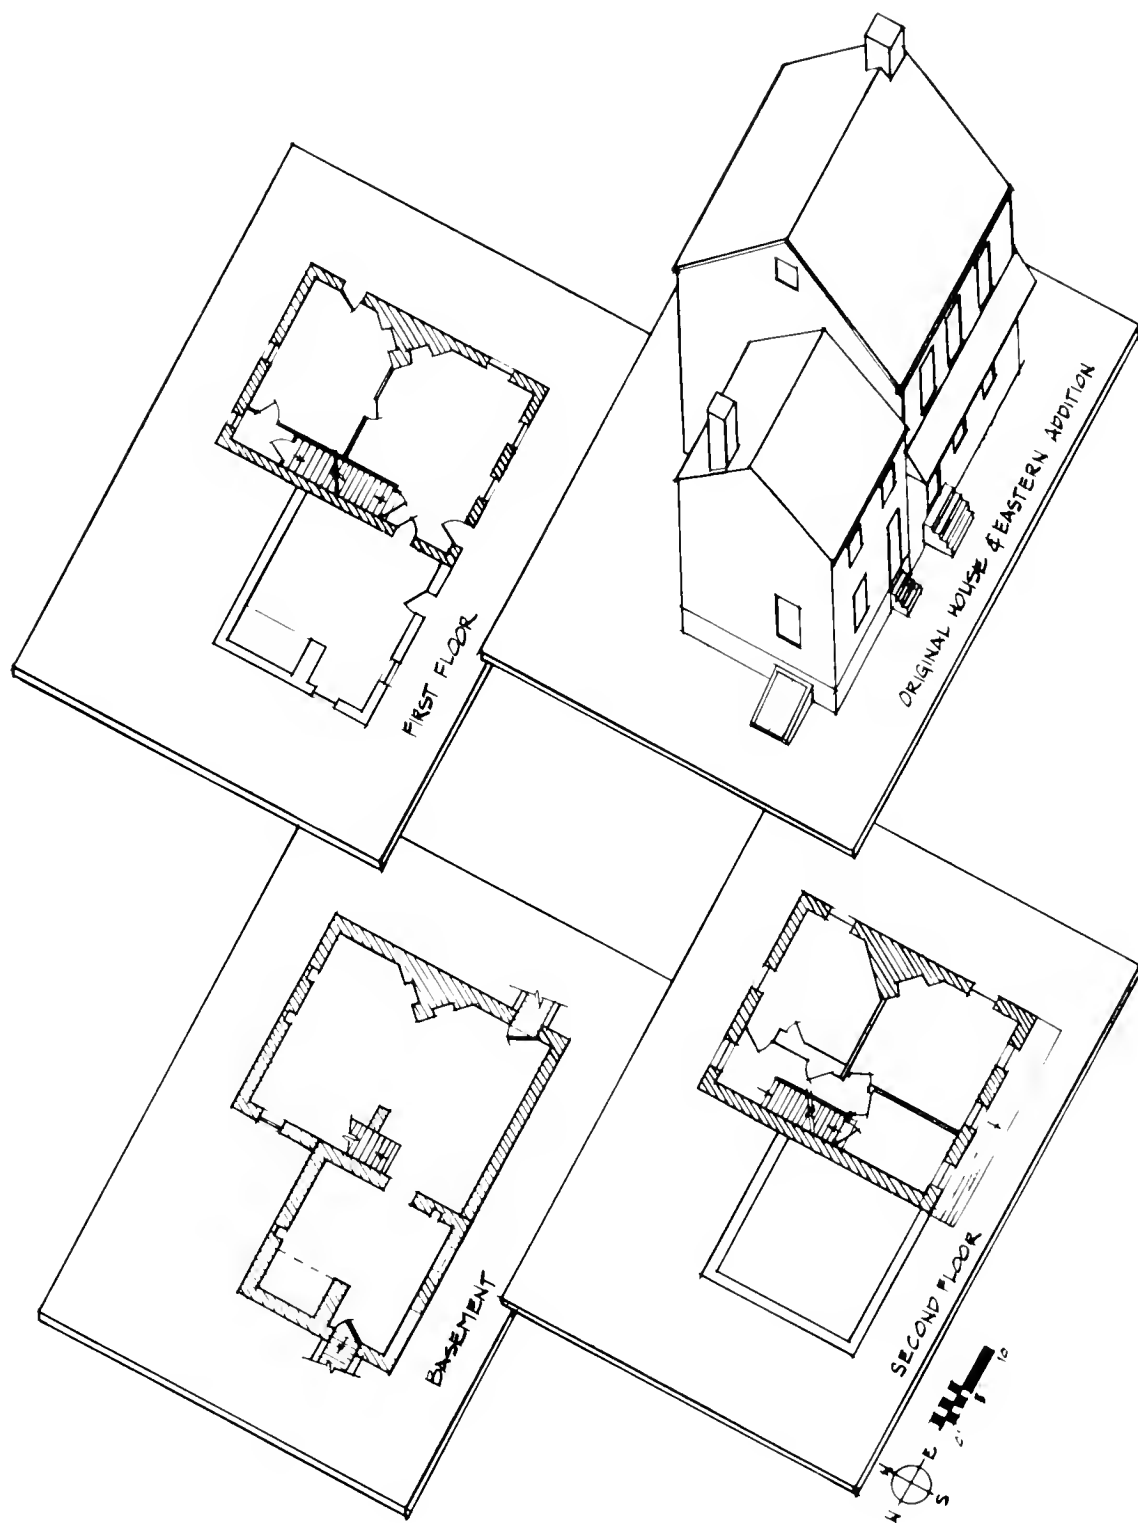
Original Farm House with two story, attic and basement addition to the east. This three bay addition likely housed a formal parlor and chambers, while the original structure was retained as the kitchen.
